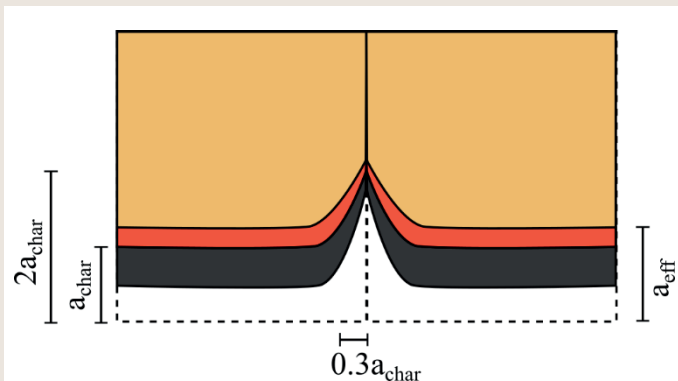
Char penetration at abutting wood elements that are unbonded (adapted from AWC, 2021)
